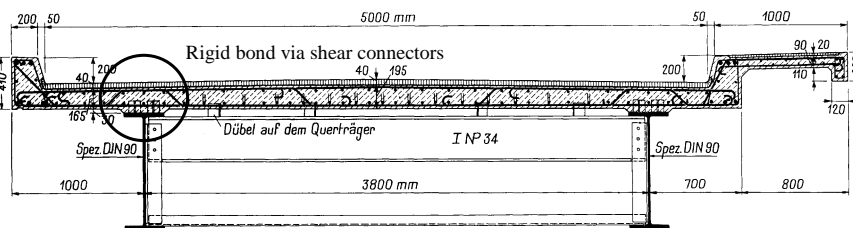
Cross section Willerzell Viaduct Switzerland, 1936 Source: T.K.V.S.B. (1944)
